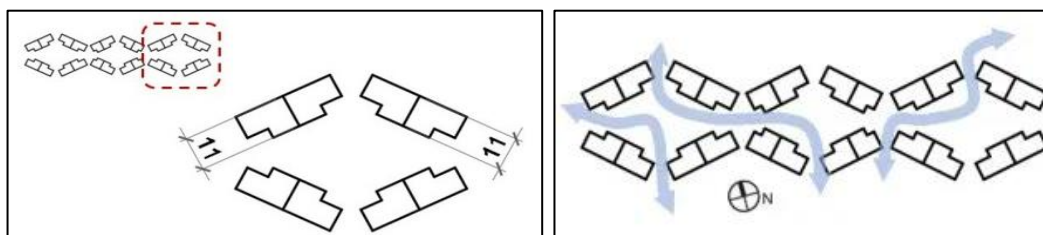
a) 11 meters wide apartment blocks enable ventilation (Sharma, Aditi Bisen, & Yanming, 2018); b) Plan of the building showing the sun path diagram (Sharma, Aditi Bisen, et al., 2018)
